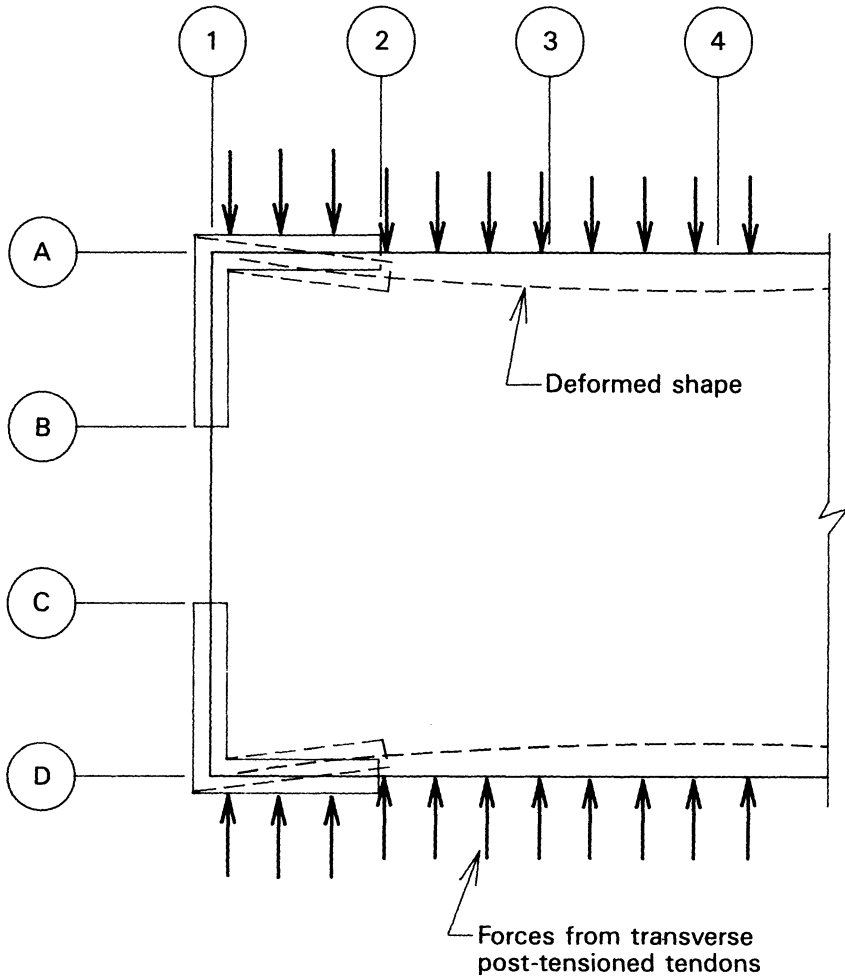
Partial plan of the building shown in Fig. 17-5, showing the transverse deformation of the roof due to the elastic shortening, creep, and shrinkage of the concrete.
